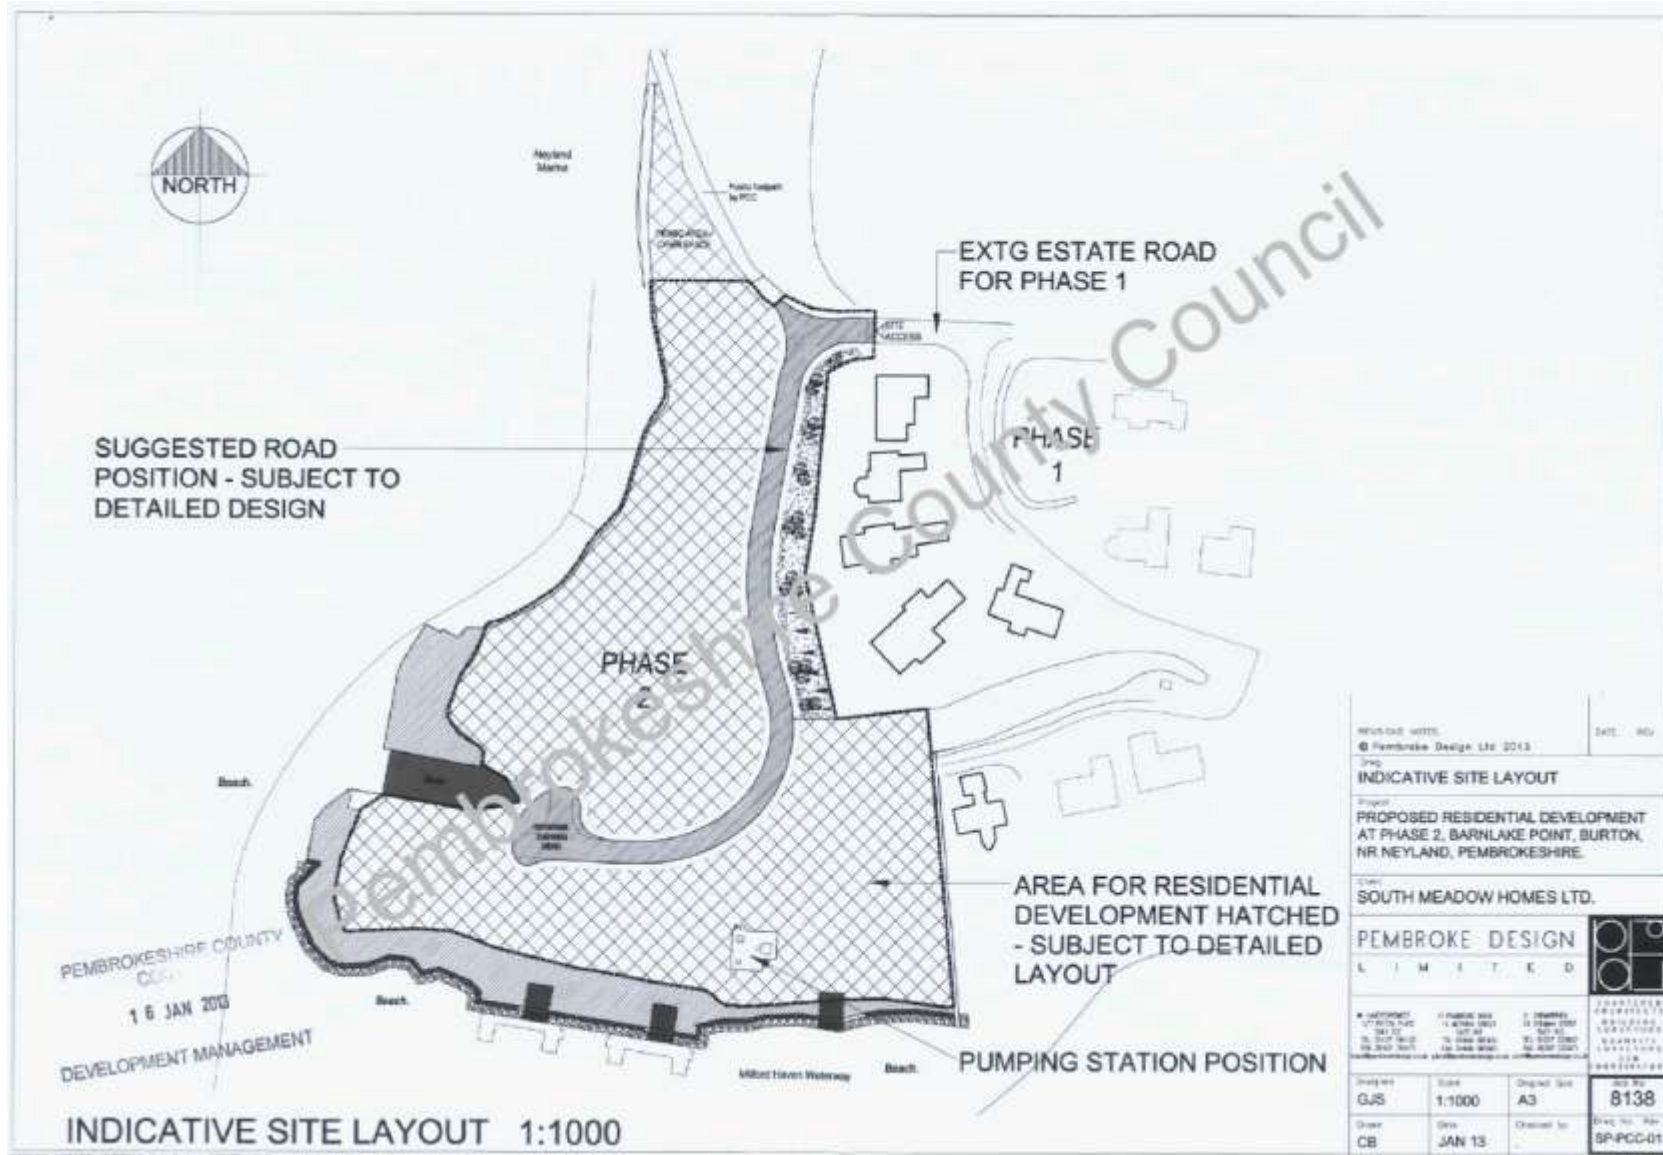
Proposed Site Layout Plan for Barnlake Point Phase 2 (taken from Excal 2011 report)
